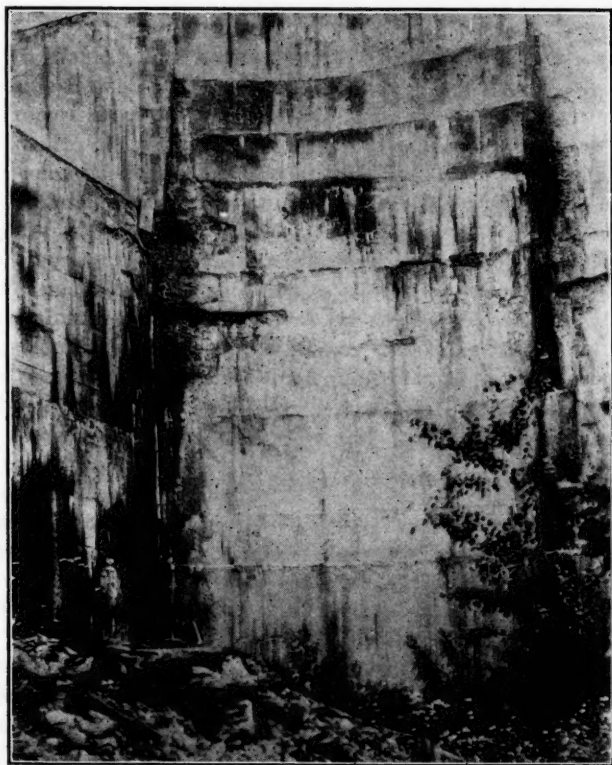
DETAIL OF DOWN-STREAM FACE, MULTIPLE-ARCH DAM (LEFT BAY IN FIG. 12), SHOWING EXTENT OF SPALLING.
